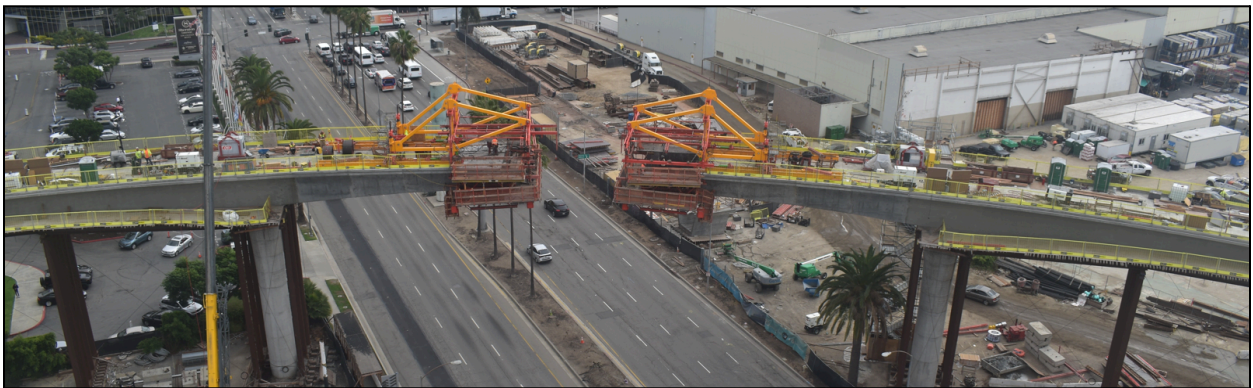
Cast-in-Place Balanced Cantilever Bridge Design and Construction:
